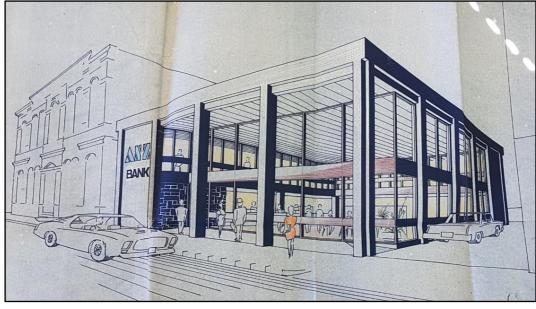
Detail from 1973 architectural rendering of the new ANZ building to be built at 4 Tay Street (Sargent and Smith and Partners, 1973).
